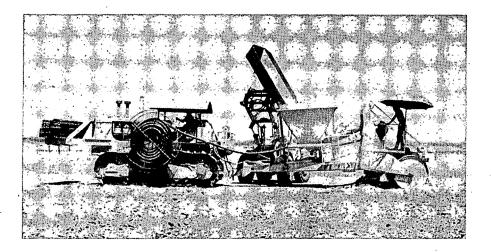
Depth gage wheel type plough, Imperial Valley, California, equipped to place gravel pack around drain tubing.
